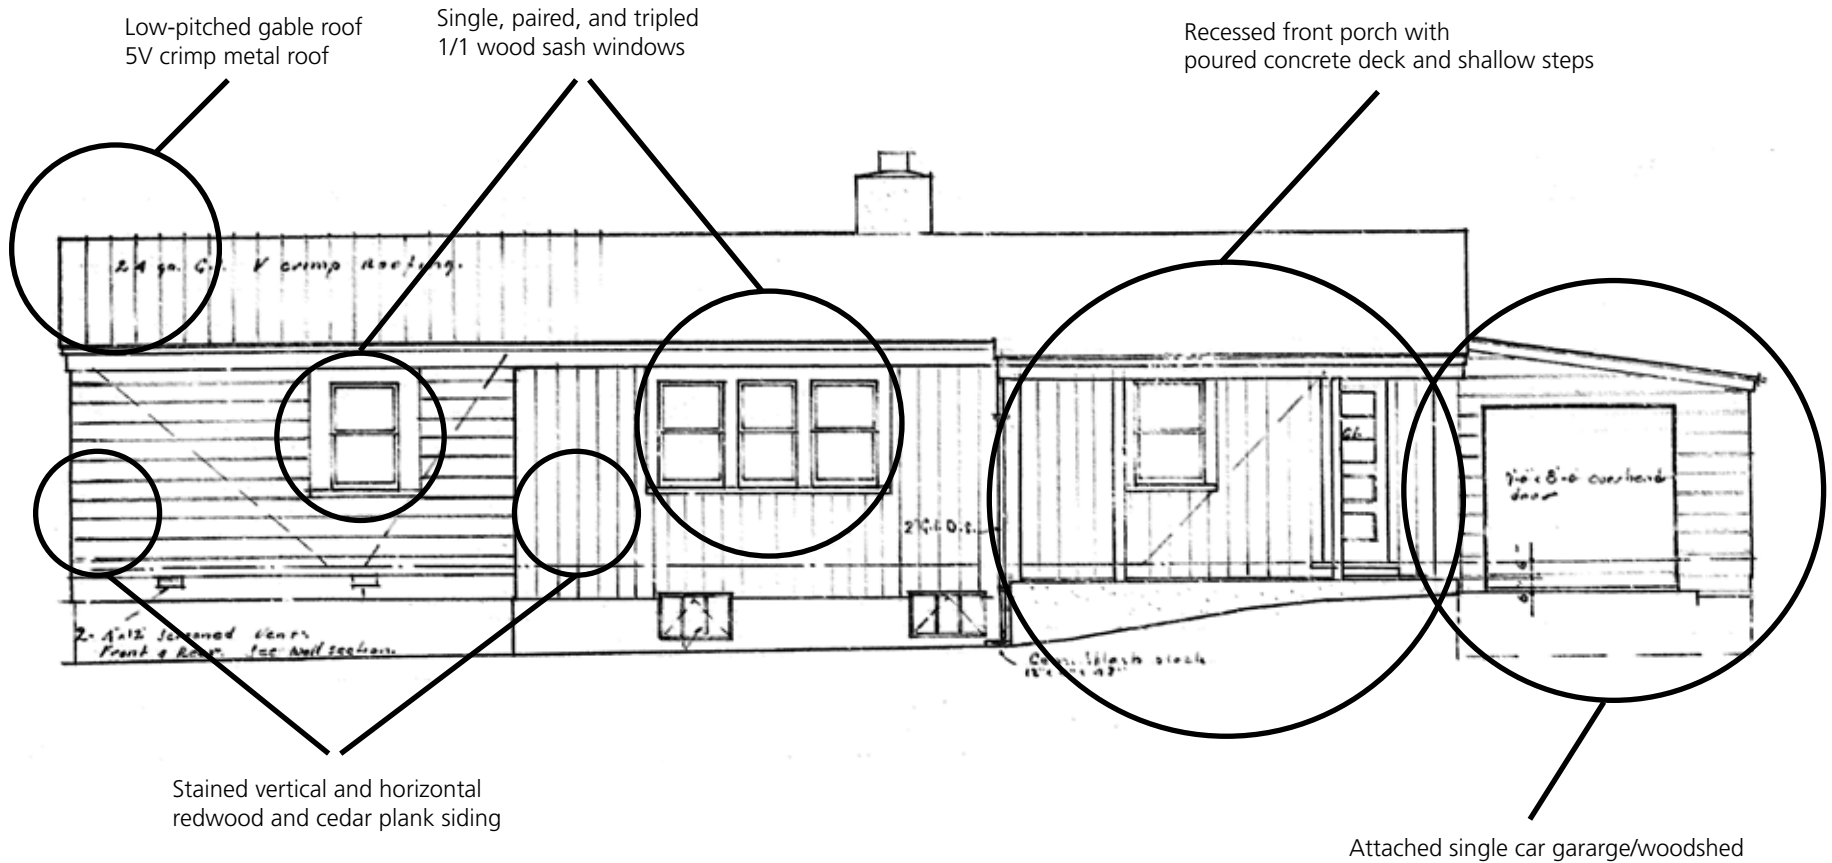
Employees Residence, general plan for buildings 27,27.28 and 34, West Elevation Plan, Drawing No. NP McK-2025B, National Park Service, Architectural Division, Regional Office, 1949 (NPS Alaska Regional Office Files)
